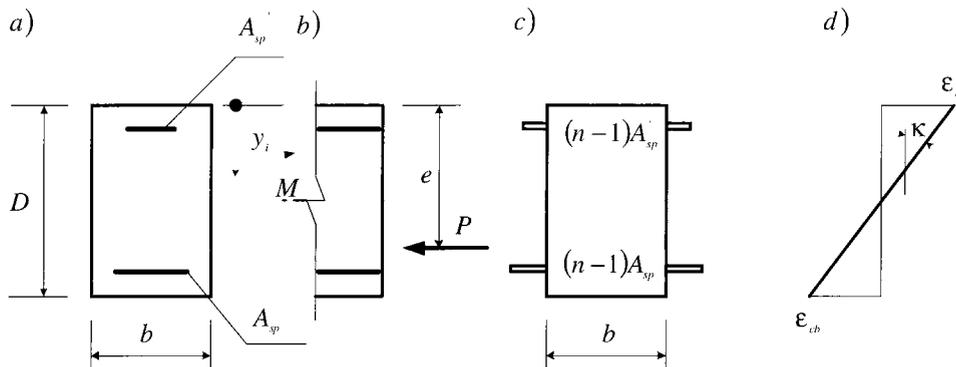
Prestressed concrete section: a – a doubly prestressed concrete section; b – prestressing force and external bending moment; c – transformed section; d – initial strain distribution
